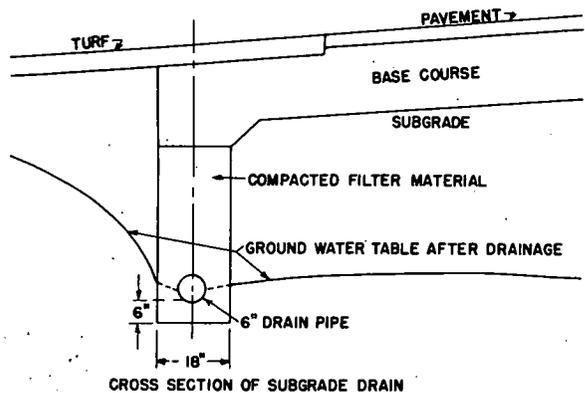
Typical Subgrade Drainage Details (After Corps of Engineers)
